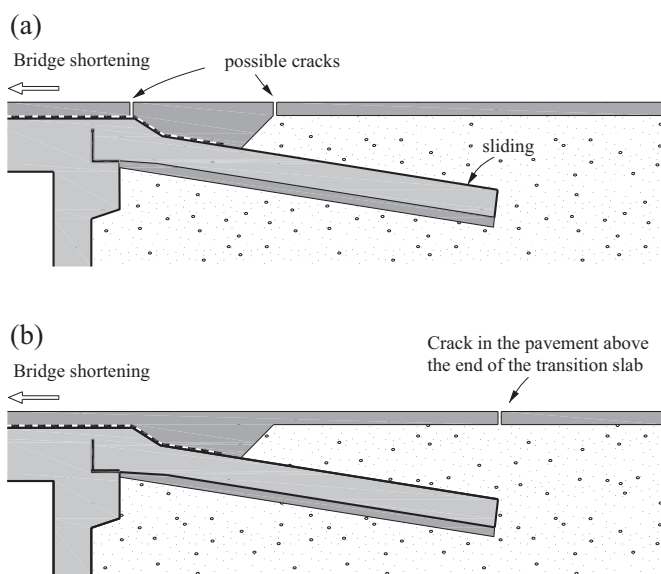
Potential cracking zones in pavement: a) close to bridge end, due to soil sliding on transition slab for case of transition slab with smooth top surface, b) at end of transition slab for a rough top surface to slab
